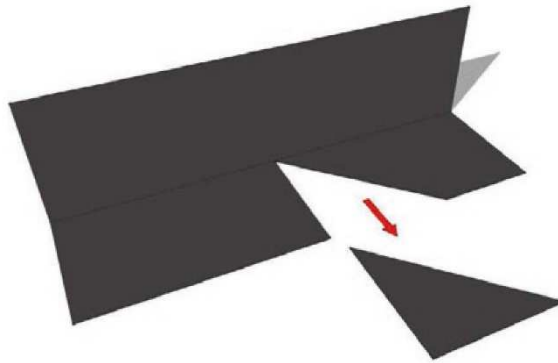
HOT AIR CROSS CONNECTION OF MEMBRANE STRIPS – CROSS-SECTION
